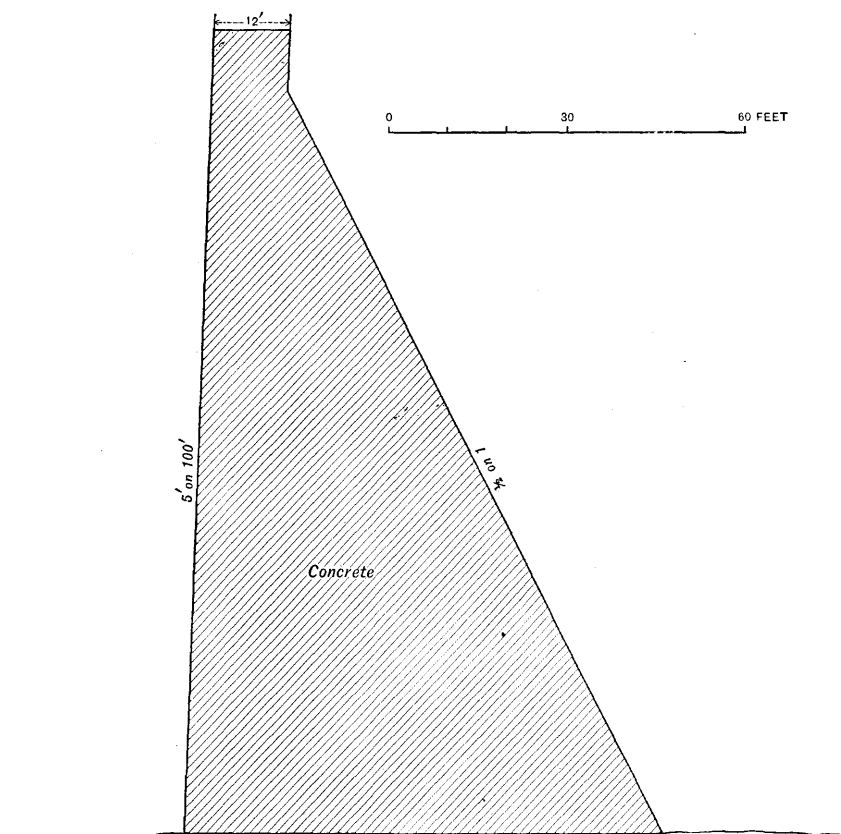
Section of concrete dam, Briscoe reservoir.
